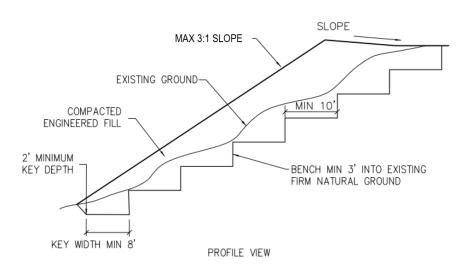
Benching detail for fill slopes greater than 5 ft
